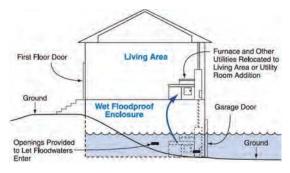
Example of a wet floodproofed building (Source: FEMA, 2009b).
